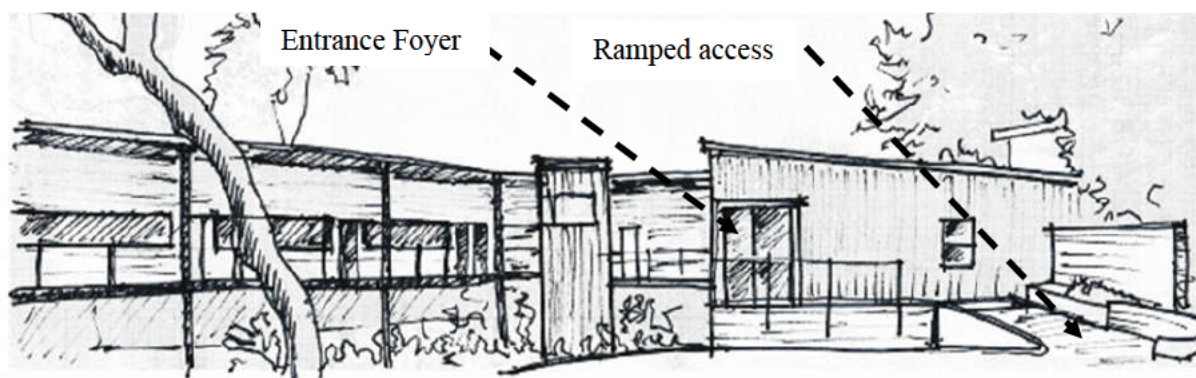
Entrance into the school building (Source: Author 2023)
